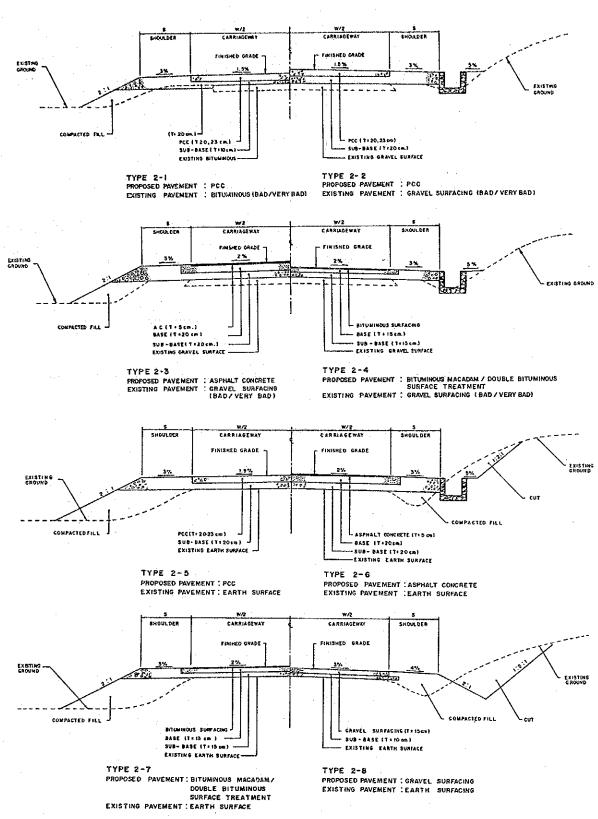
TYPICAL ROAD SECTIONS (1)
